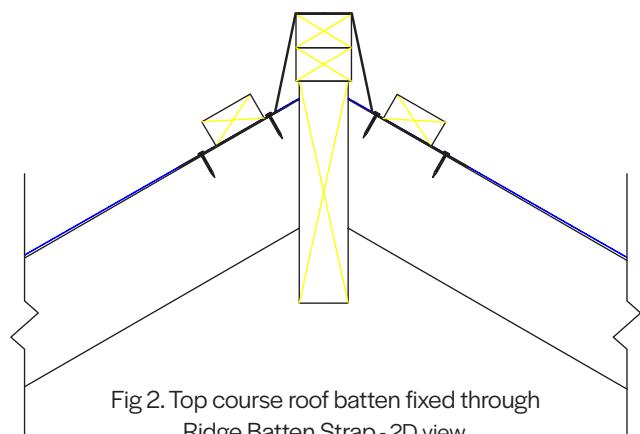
Top course roof batten fixed through Ridge Batten Strap - 2D view.
